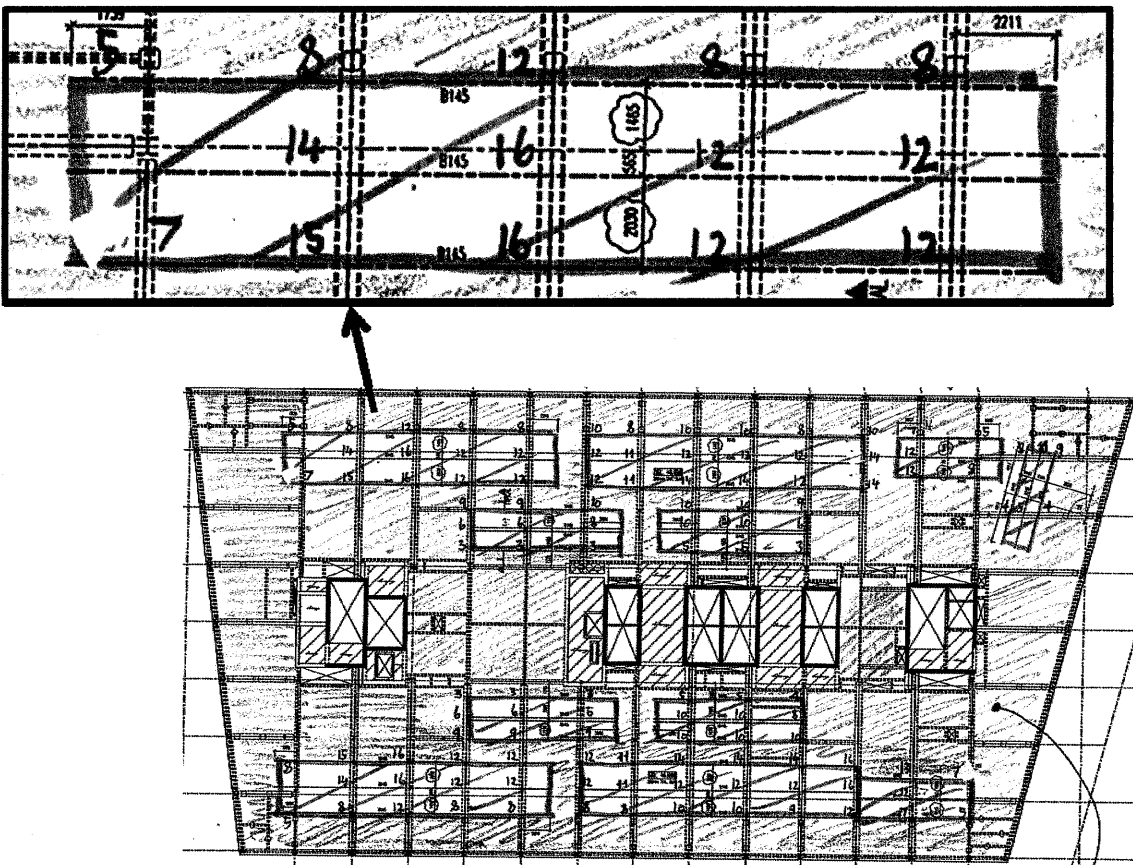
Calculated Deflections of the Roof Slab under Floating Slab + Plant Loadings
